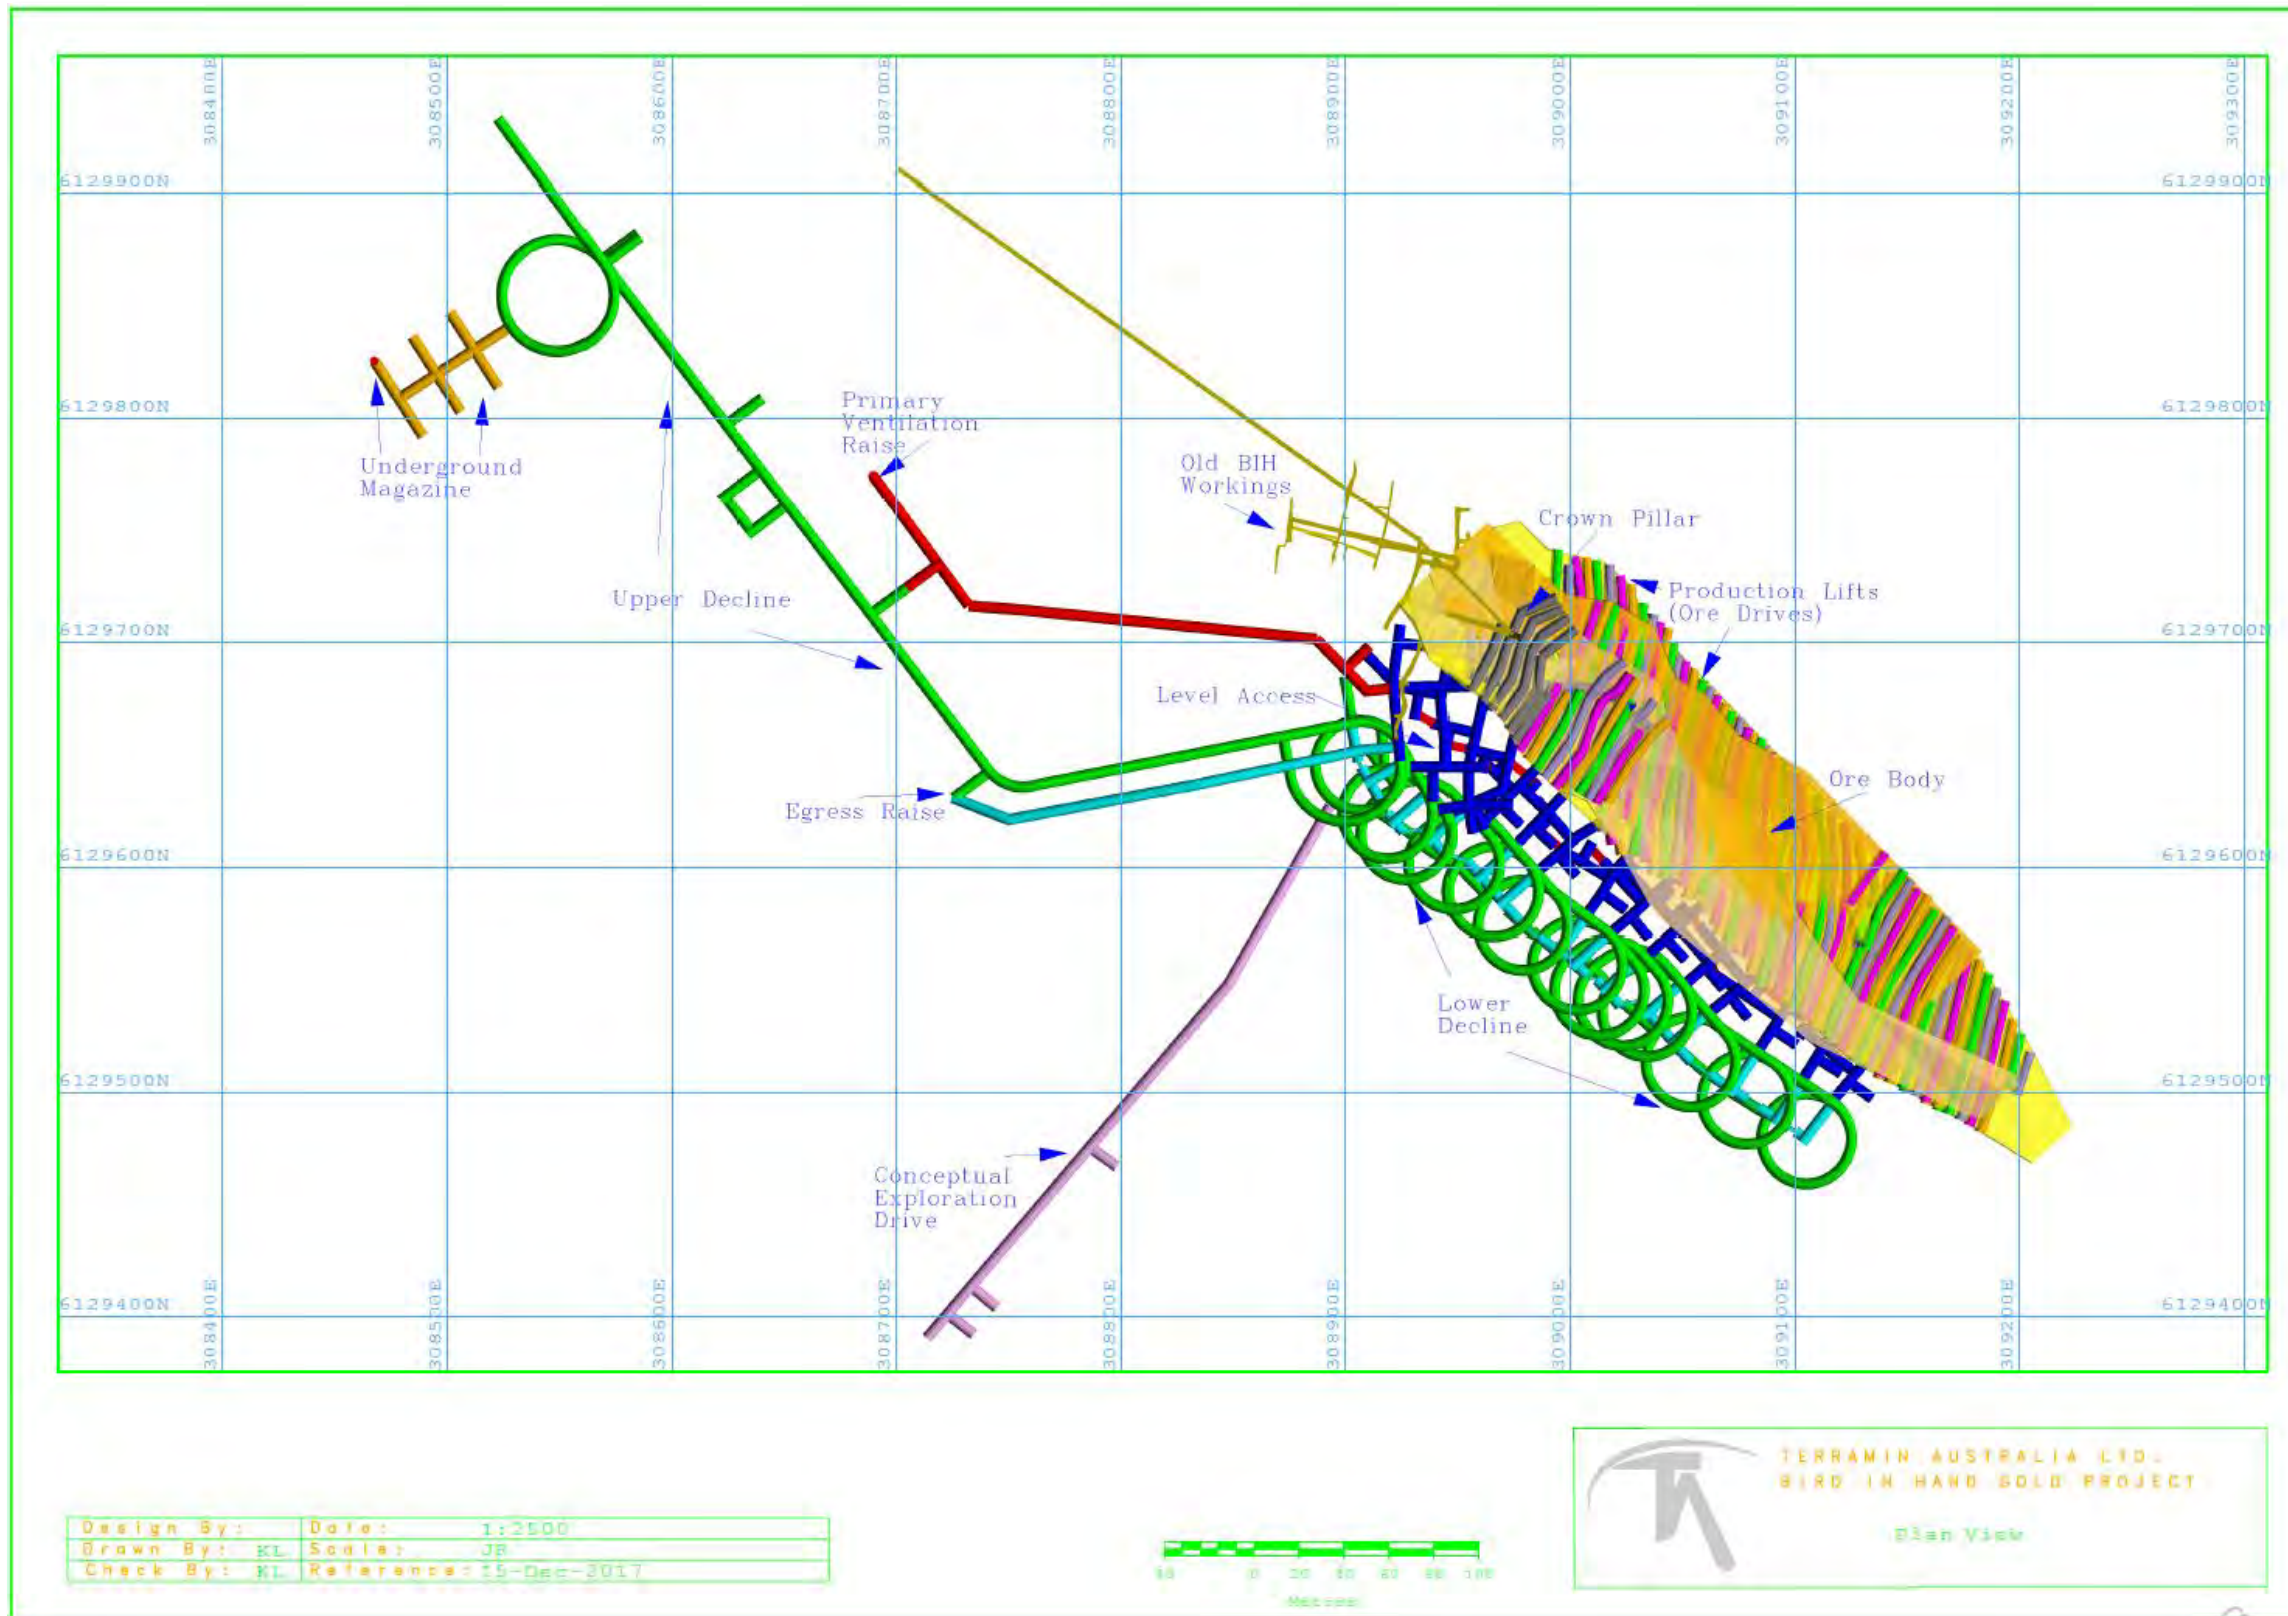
| PLAN VIEW OF UNDERGROUND WORKINGS ONLY
